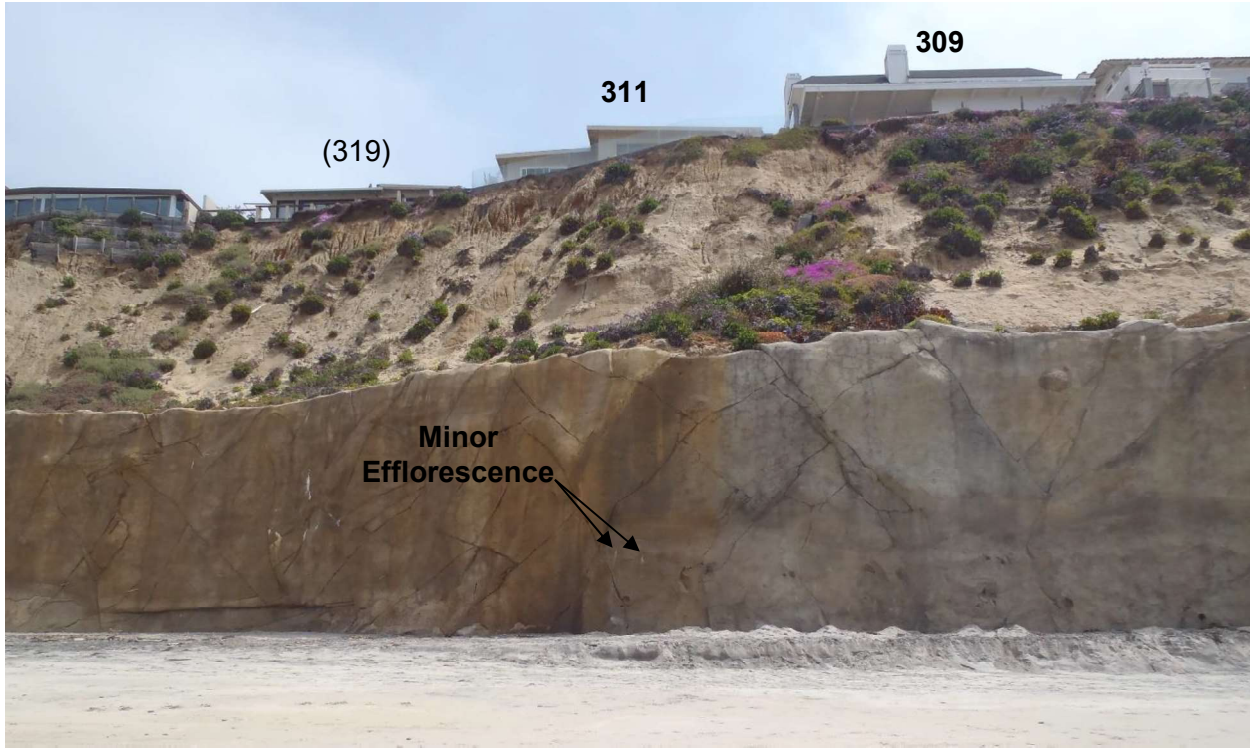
Seawall below 319 to 309 Pacific Avenue (April 26, 2023).
